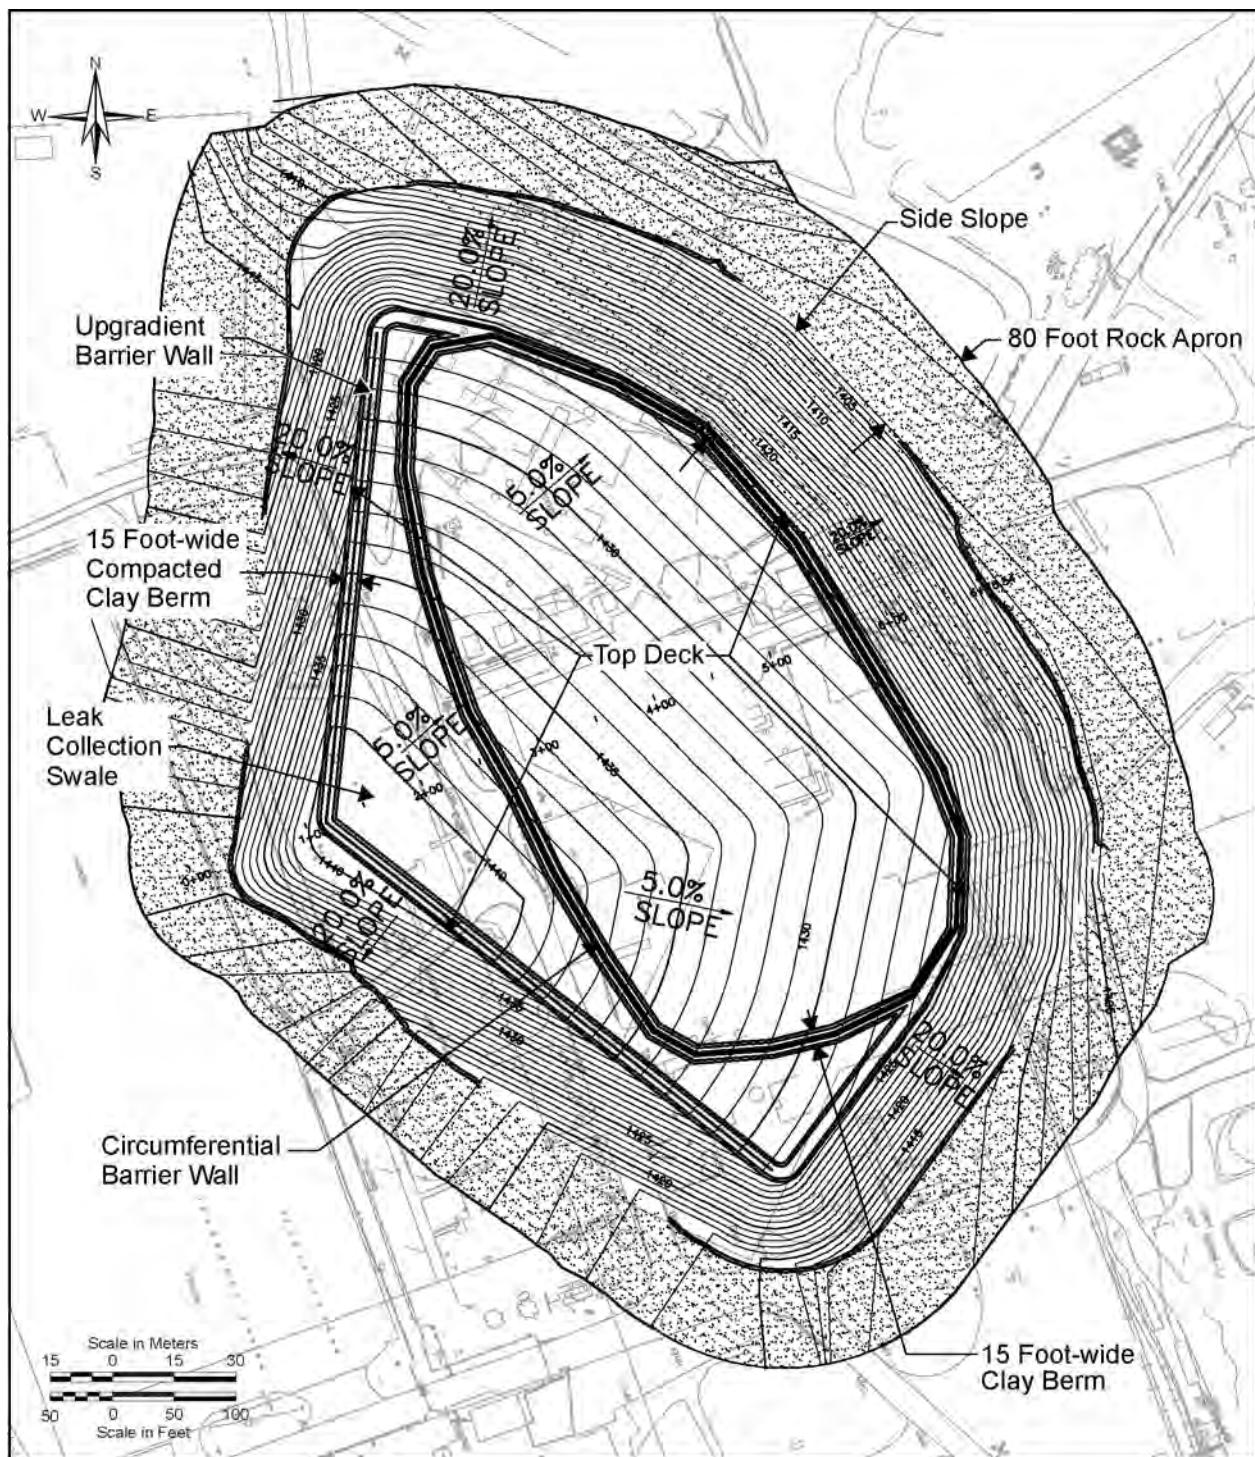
North Plateau Closure Cap Conceptual Plan View
